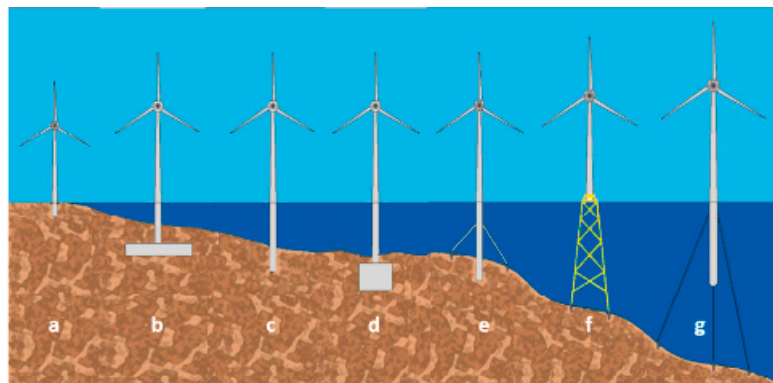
Schematic of wind turbine foundations: a. pile foundation (on land); b. gravity foundation; c. monopile; d. suction bucket foundation; e. tripod foundation; f. jacket foundation; g. floating foundation(TLP). (X. Wang and Li 2020)
